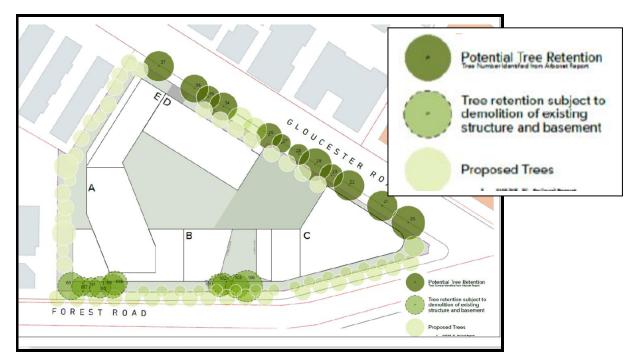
Potential Tree Retention and Proposed Trees (Source: Figure 9 in Section 8.3.9 of HDCP No 2)
